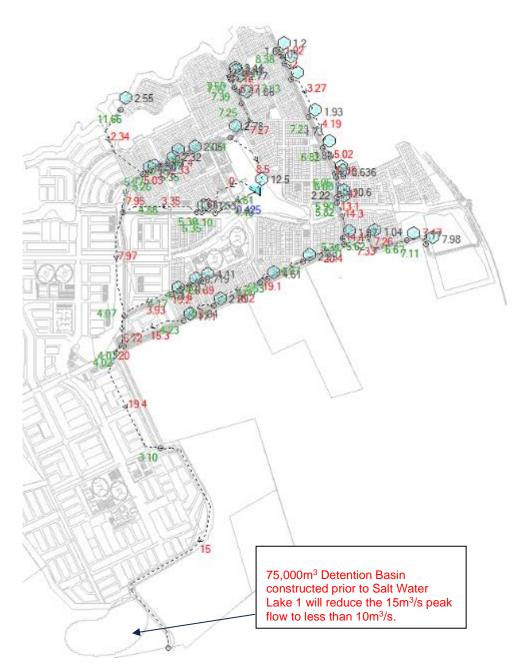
Interim Solution – DRAINS Model - Post construction of Salt Water Lake 1
